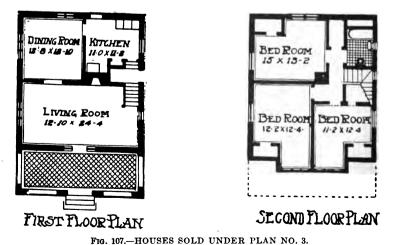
HOUSES SOLD UNDER PLAN NO. 3.
